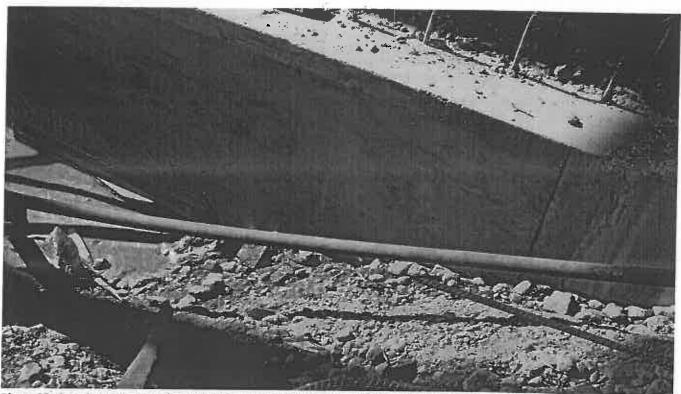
Ongoing pumping of muddy groundwater from foundation footing into active stormdrain onsite.
